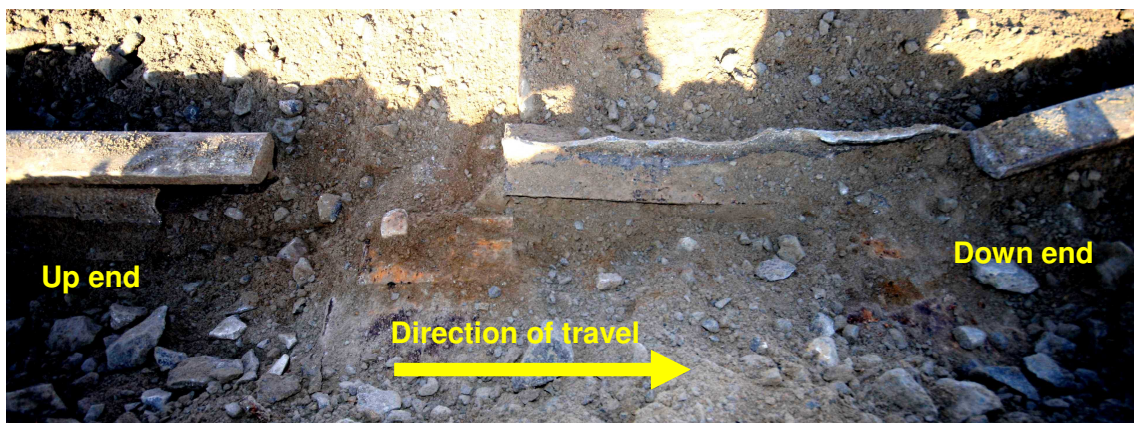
Damaged section of rail after excavation and removal of fractured pieces of rail
